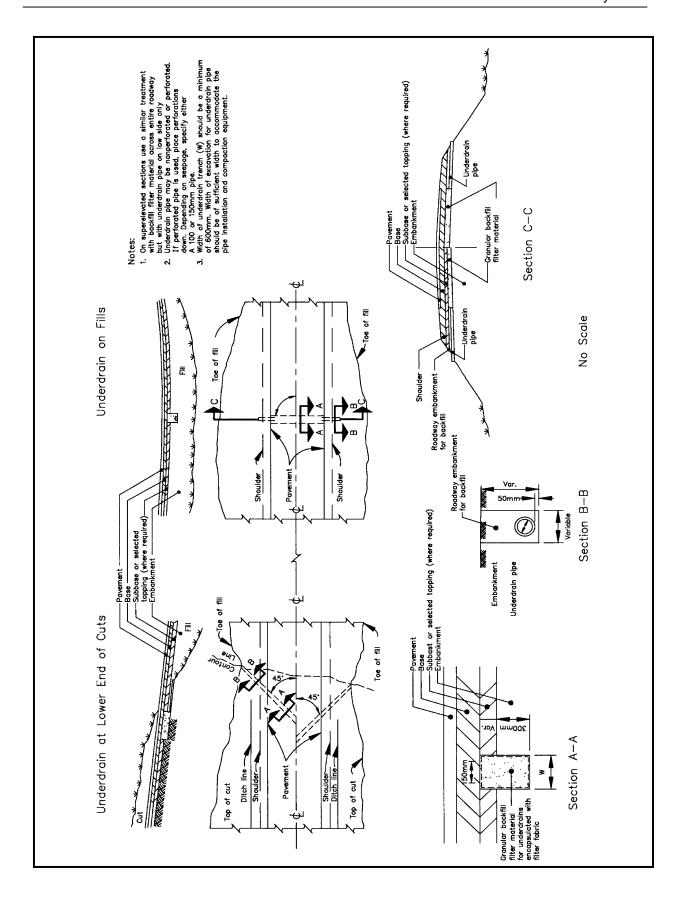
L TYPICAL UNDERDRAIN INSTALLATION BENEATH THE ROADBED (Metric)
